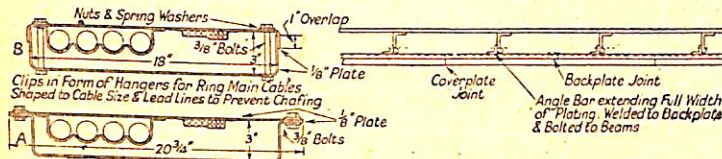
Typical section of cable plating (left) and method of fixing cable plating (right)
